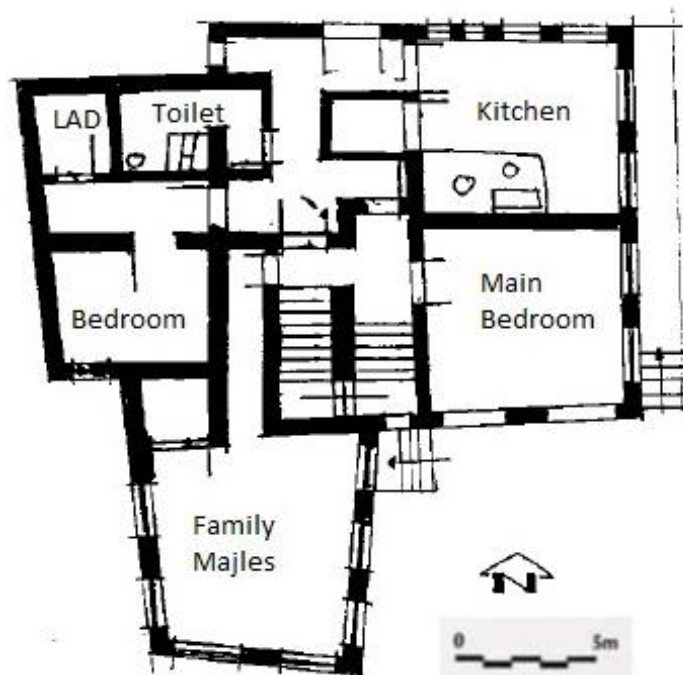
Sheikh Abu Bakr House (Third Floor) Mukalla (Al-Maashi, 1998)
